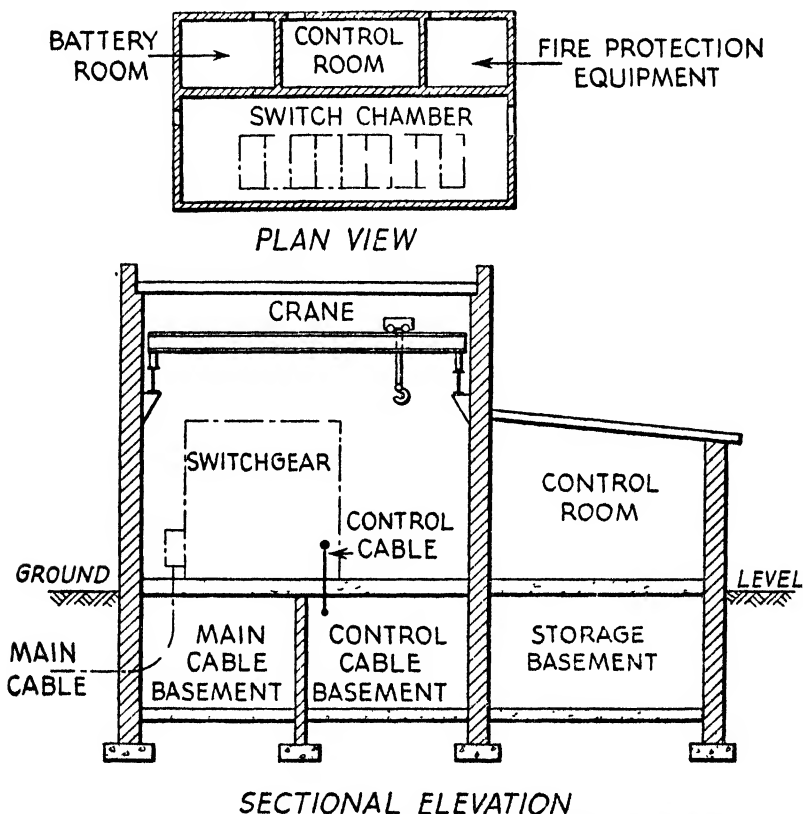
TYPICAL ARRANGEMENT OF LARGE CAPACITY SUB-STATION
